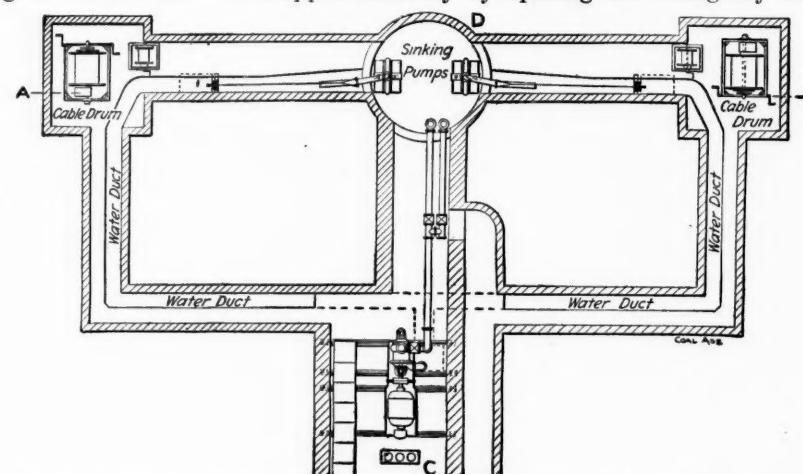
GENERAL ARRANGEMENT OF ELECTRIC PUMPING PLANT AT THE 600-FT. INSET
